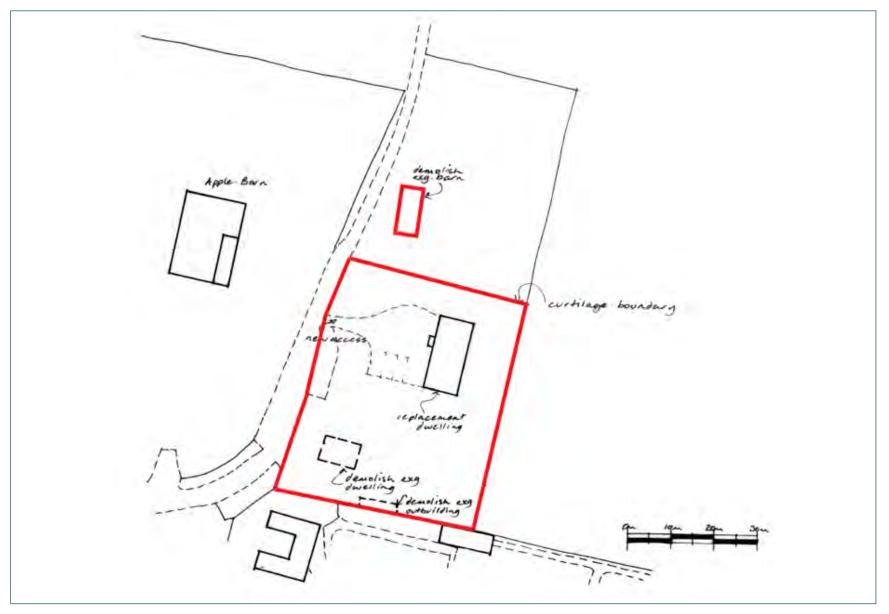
Proposed Layout Plan (Fowler Architecture and Planning, Recieved July 2023).
